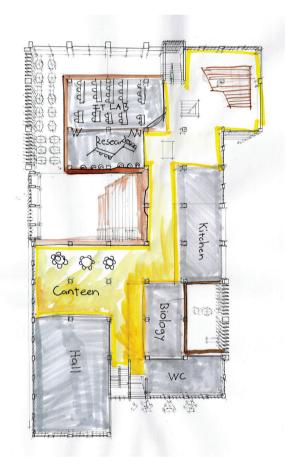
Conceptual Fourth Floor Plan, August 2016
